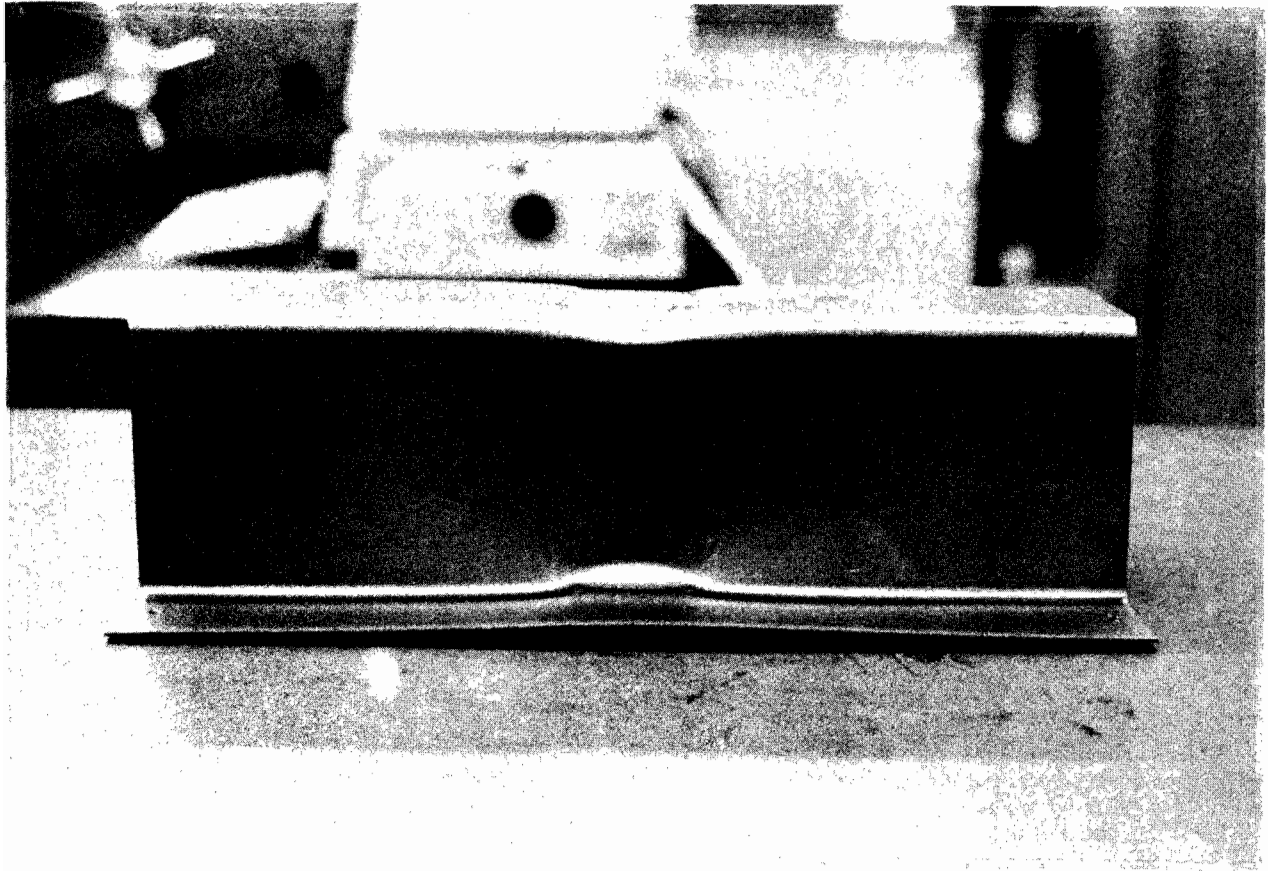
Photograph Showing Typical Failure of Hat Section
